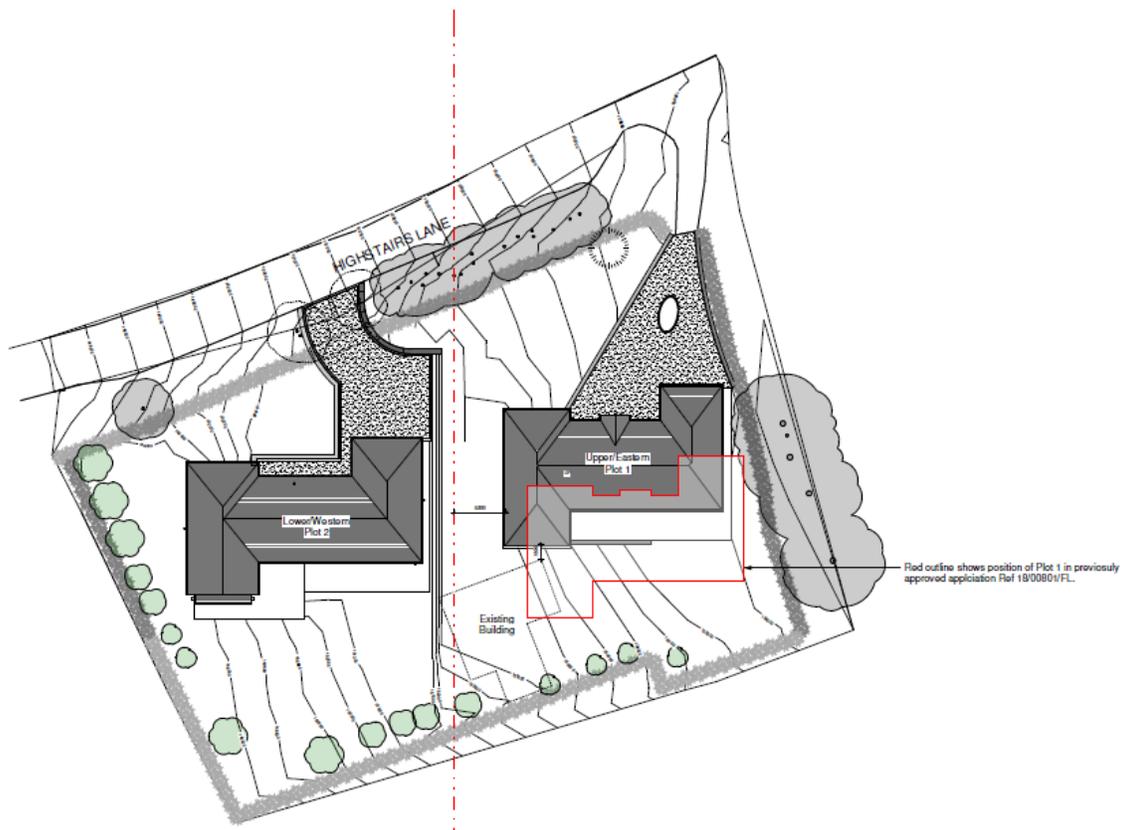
Site Plan showing revised position of plot 1 with original position outlined in red.
